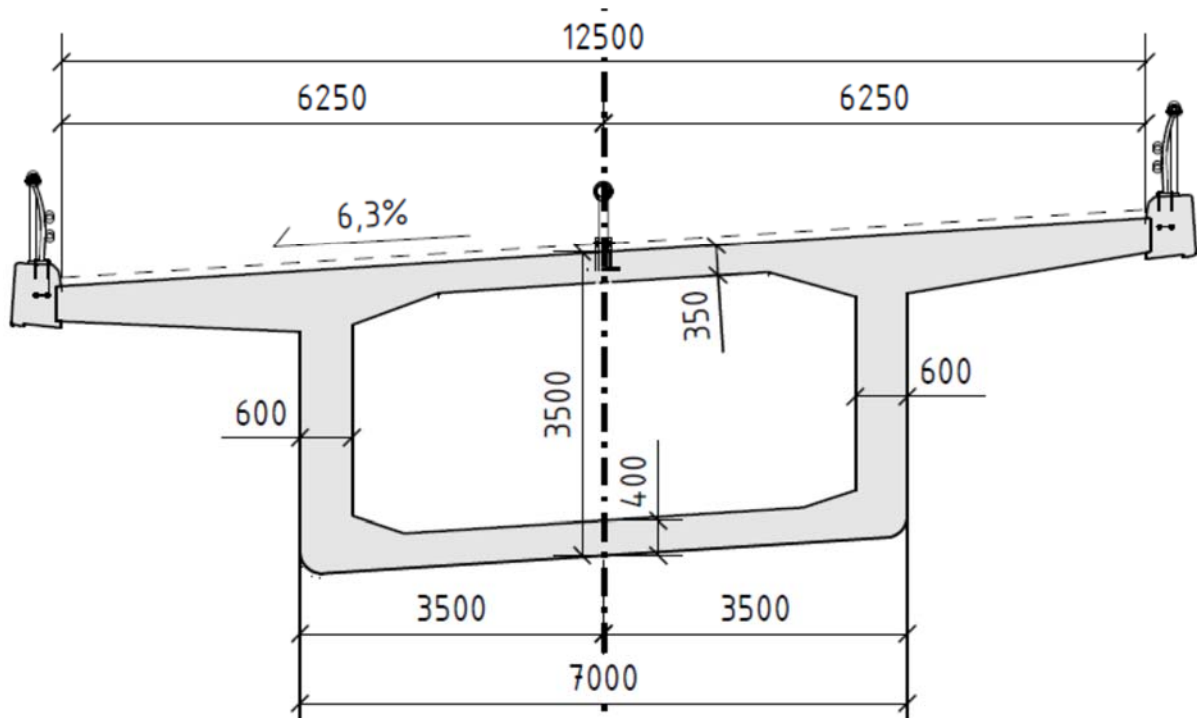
Cross sections of abutment, designed and programmed, cantilever phase, concrete variant
